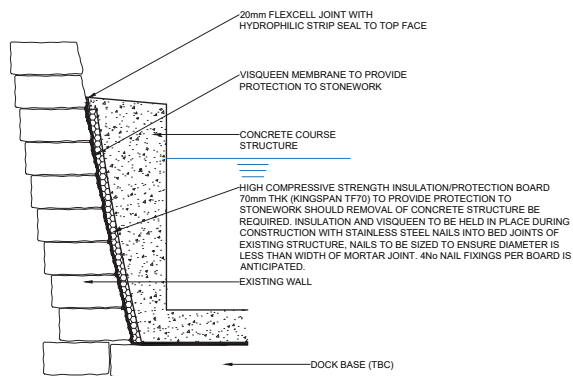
Detail showing the construction of the new concrete wall alongside the existing dock wall.
